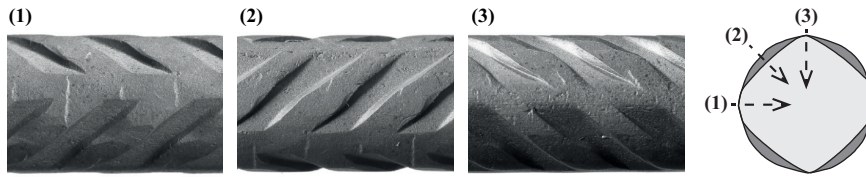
Details of the reinforcement ($d_b = 14$ mm) used for the deformed hooks (SB12)
